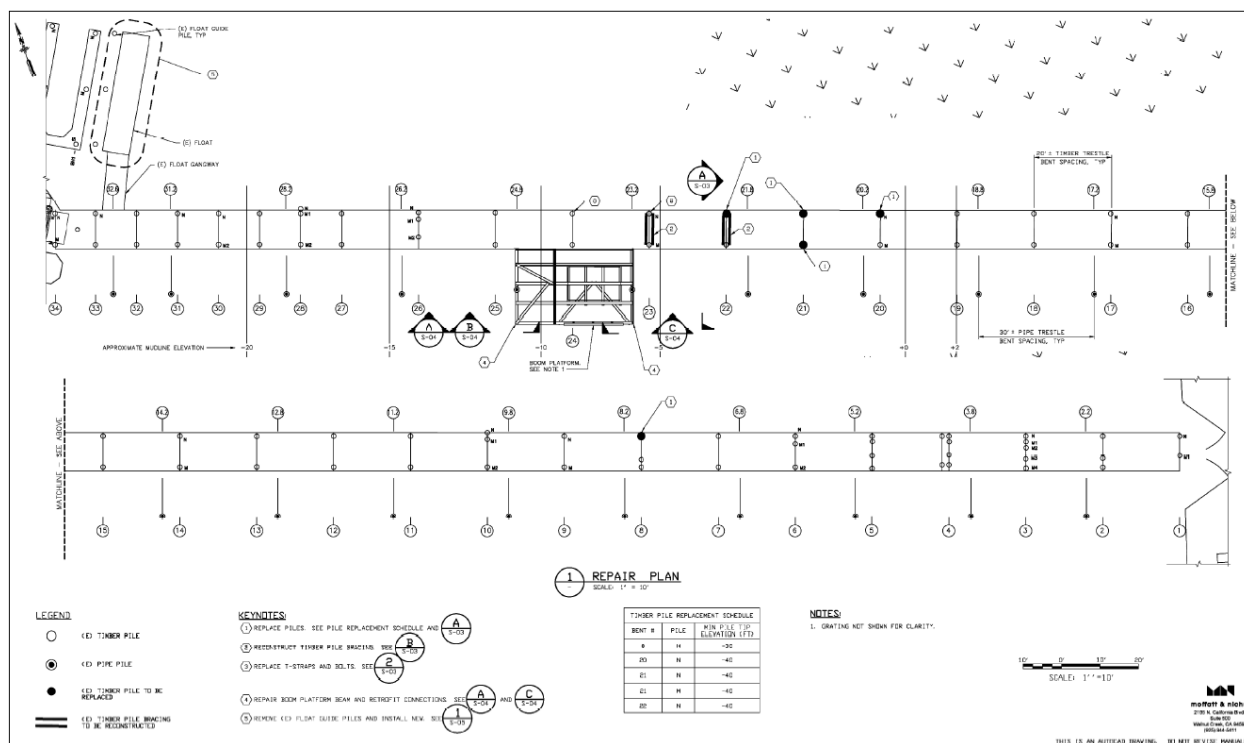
General Plans for 2025 Causeway Upgrades and Repairs at the Chevron Eureka Terminal
